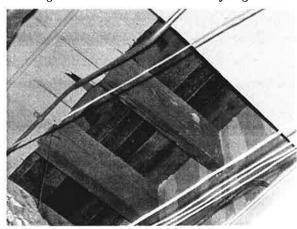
MEP equipment installations have necessitated the removal of original fabric. This image shows the construction of the second floor, including the original 4" pine plank flooring.
